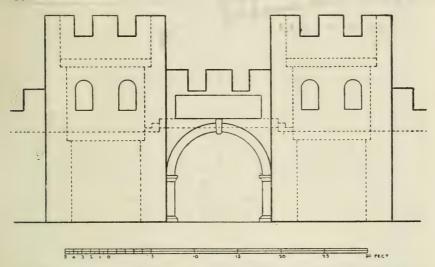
Restoration of North Gateway showing turrets with flat roofs.
